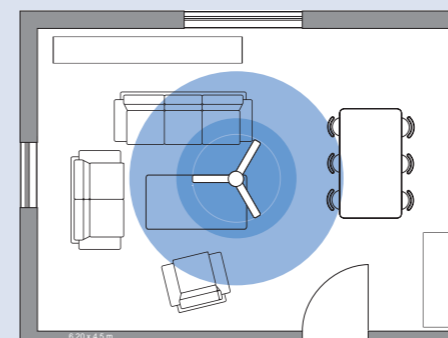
Summer ventilation in the living/dining room with a ceiling fan Ø 132 cm
